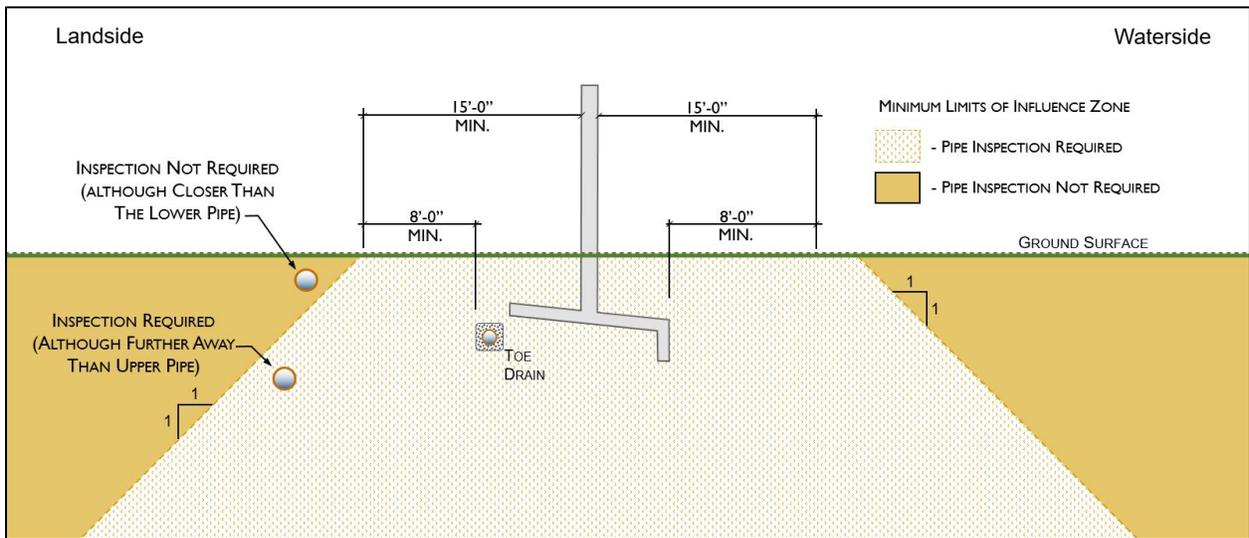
Gravity pipes adjacent to a floodwall (T-wall).
